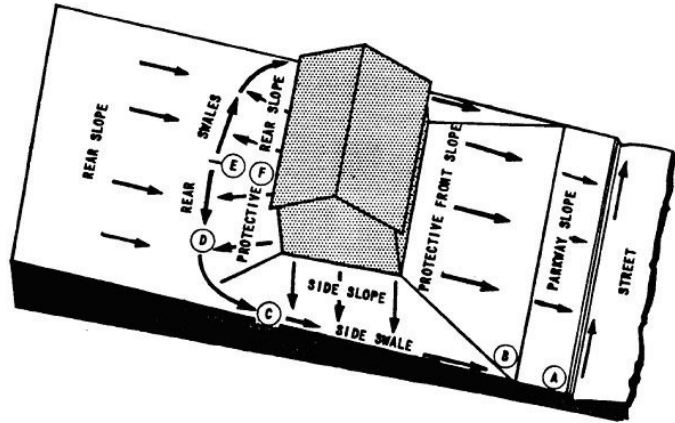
TYPICAL FHA-HUD LOT GRADING
